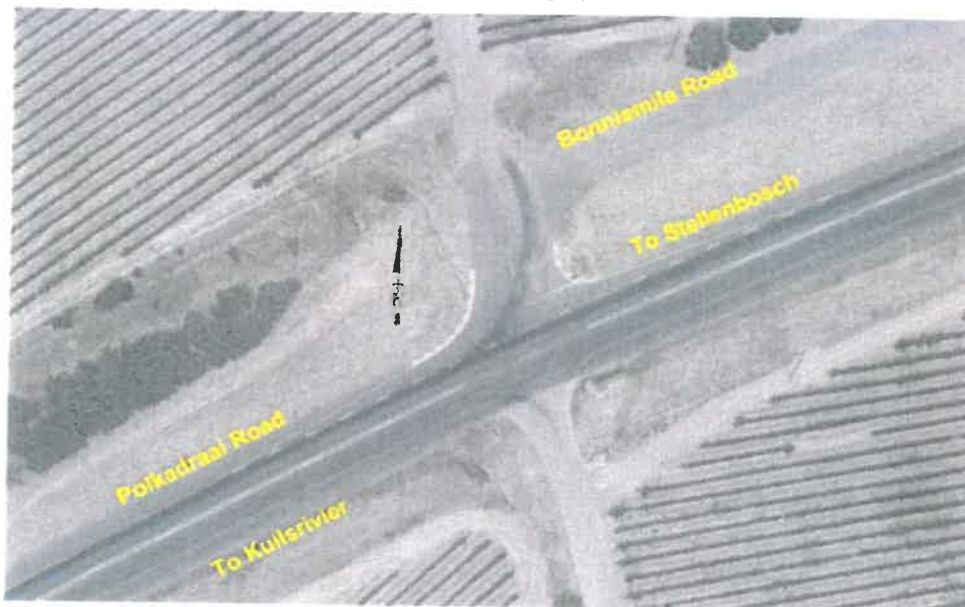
Existing Polkadraai Road/Bonniemile Road (II) intersection
